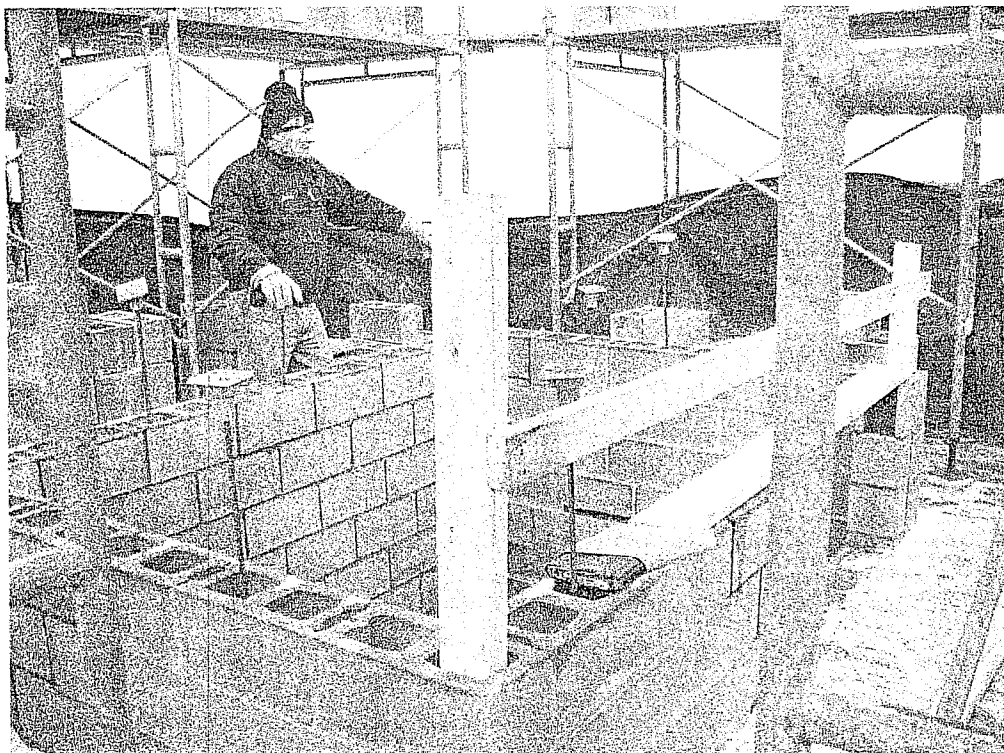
Masonry elevator shaft being installed inside tented / heated protection from weather.
